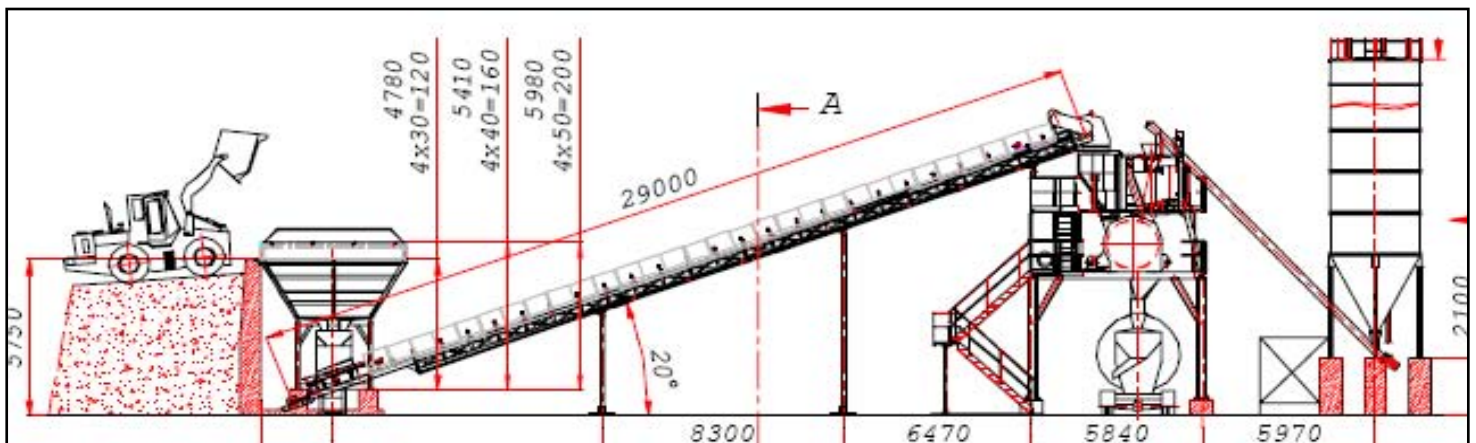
Original contractor design for the 100-m³/hour concrete-mixing plant
